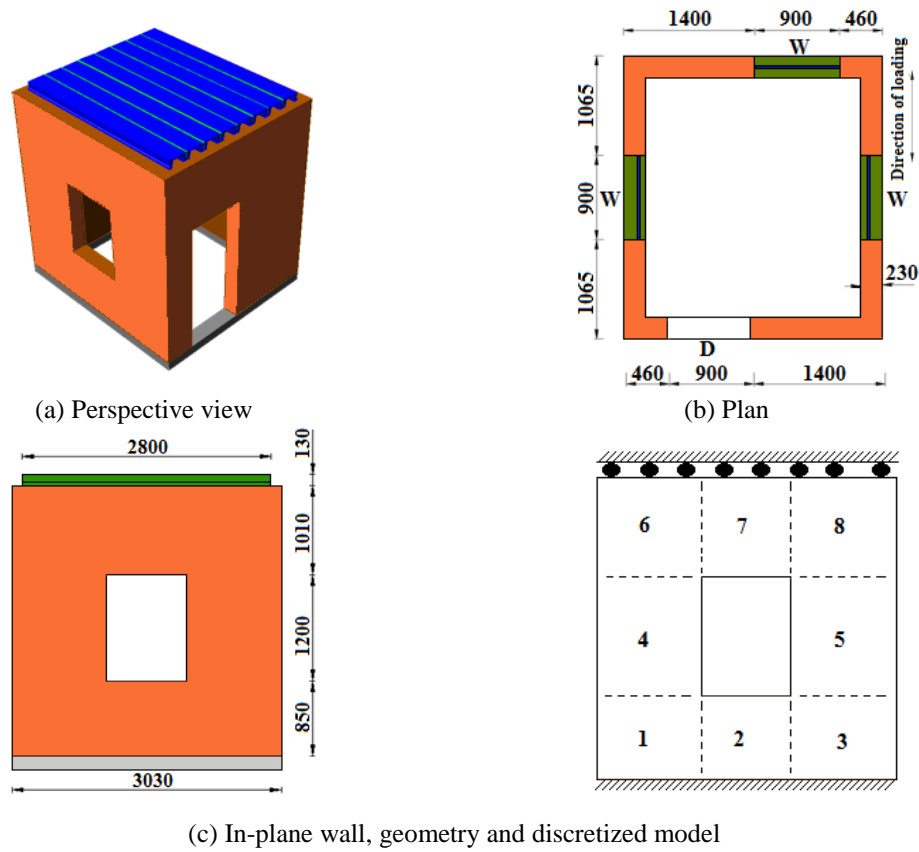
Brick masonry building considered in the study (All dimensions are in ‘mm’)
